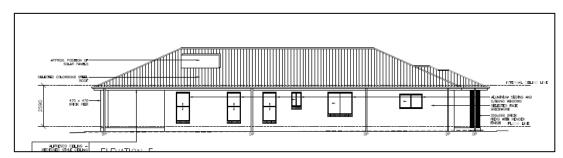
Northern Side Windows of Proposed Dwelling at No.18 Sydney Avenue
